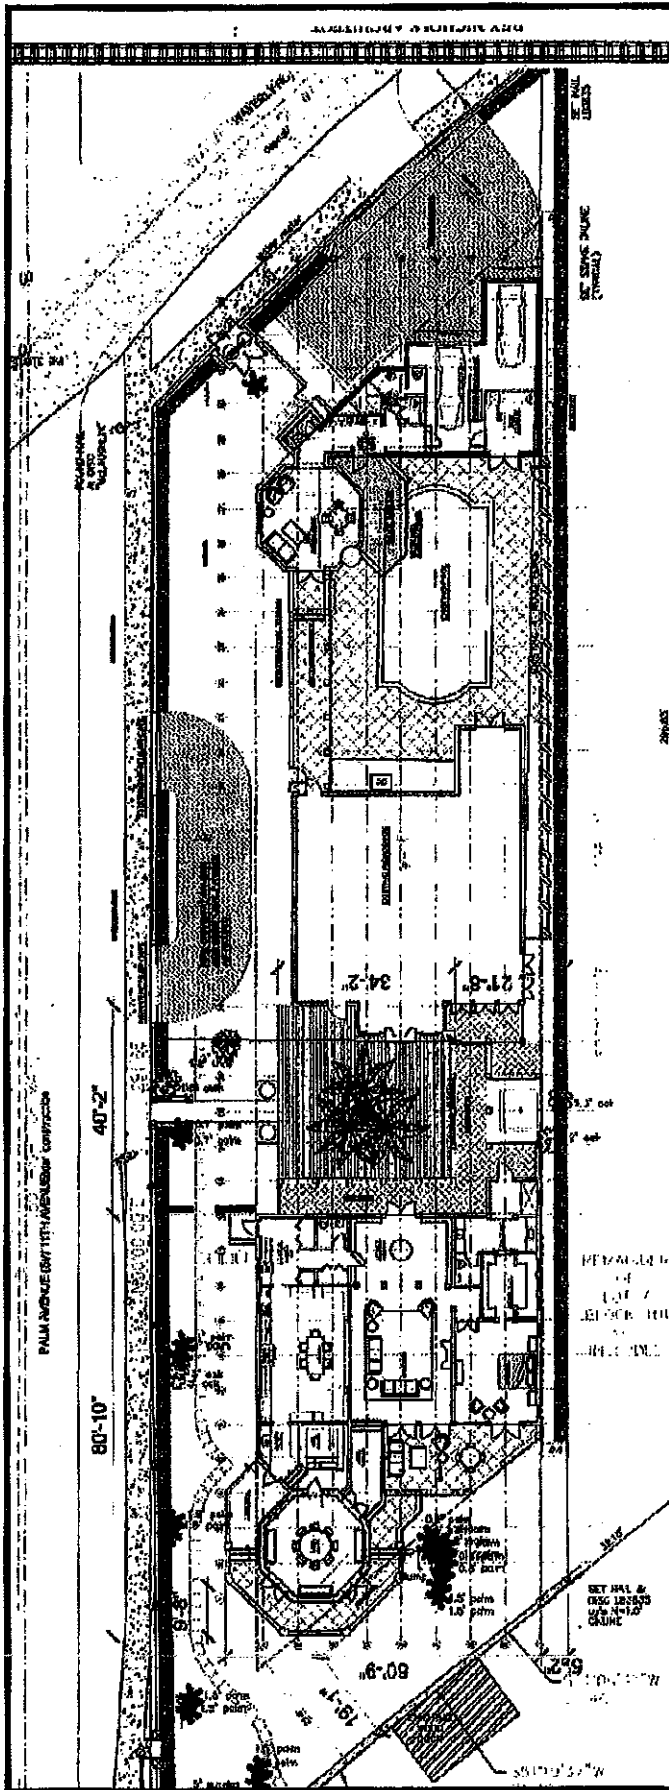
Plan view of existing and proposed construction. Area shaded in yellow (north side of property) is developed. Un-shaded area represents planned development
